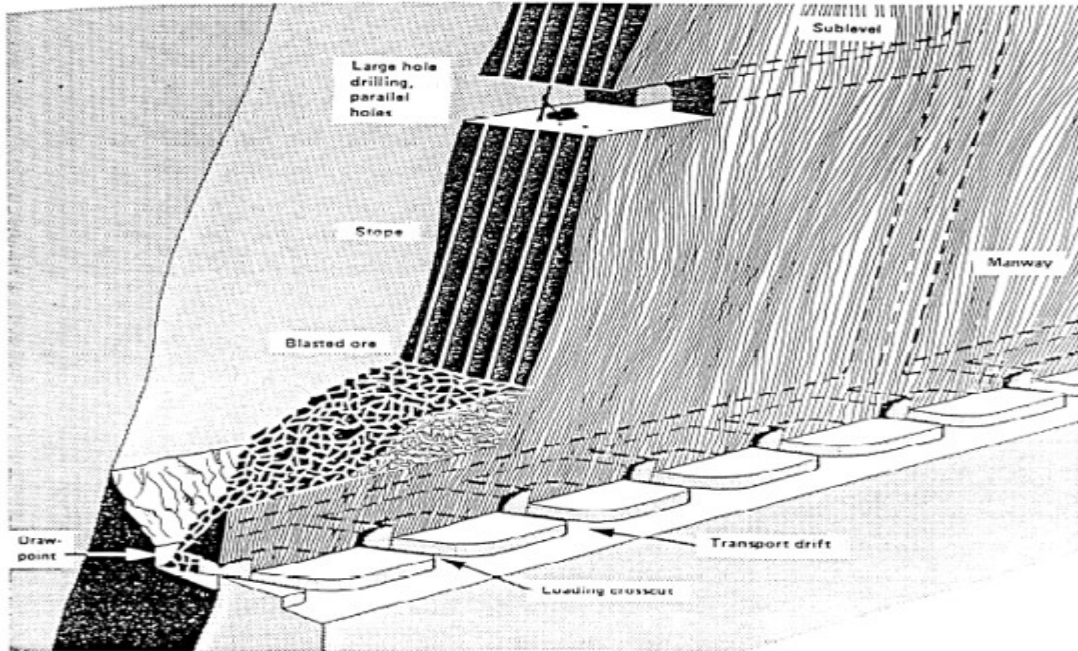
Parallel hole system of stope drilling from a drill sill (Hamrin, 1982)
